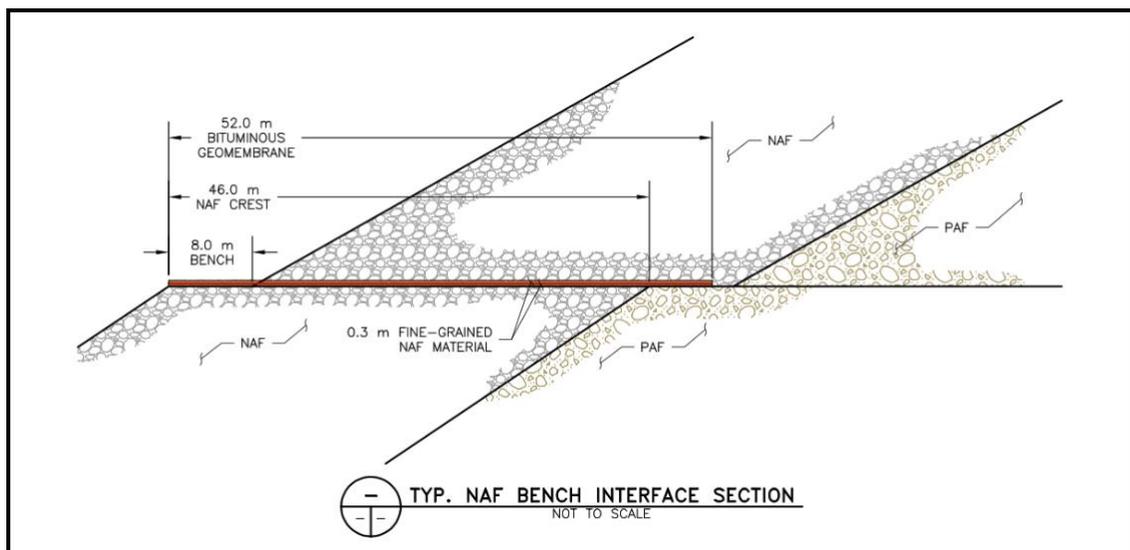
Typical NAF Bench Interface Section, Tierra Group 2025
